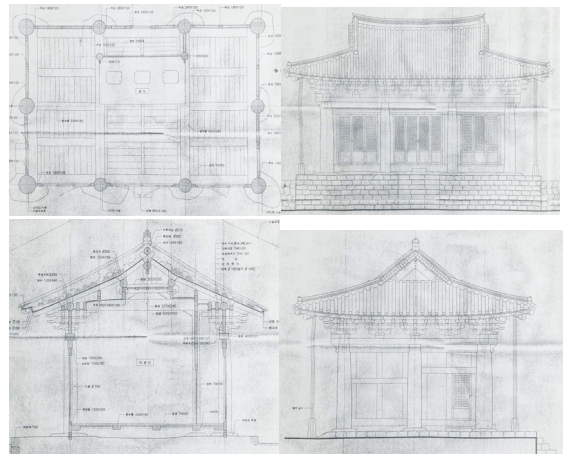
Eungseogsa Daeungjeon (Plane, Elevation, Side, Longitudinal section)
